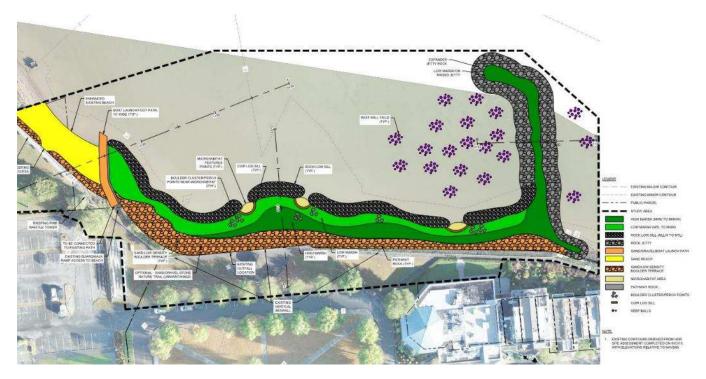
Proposed Piermont Living Shoreline Site Plan.
